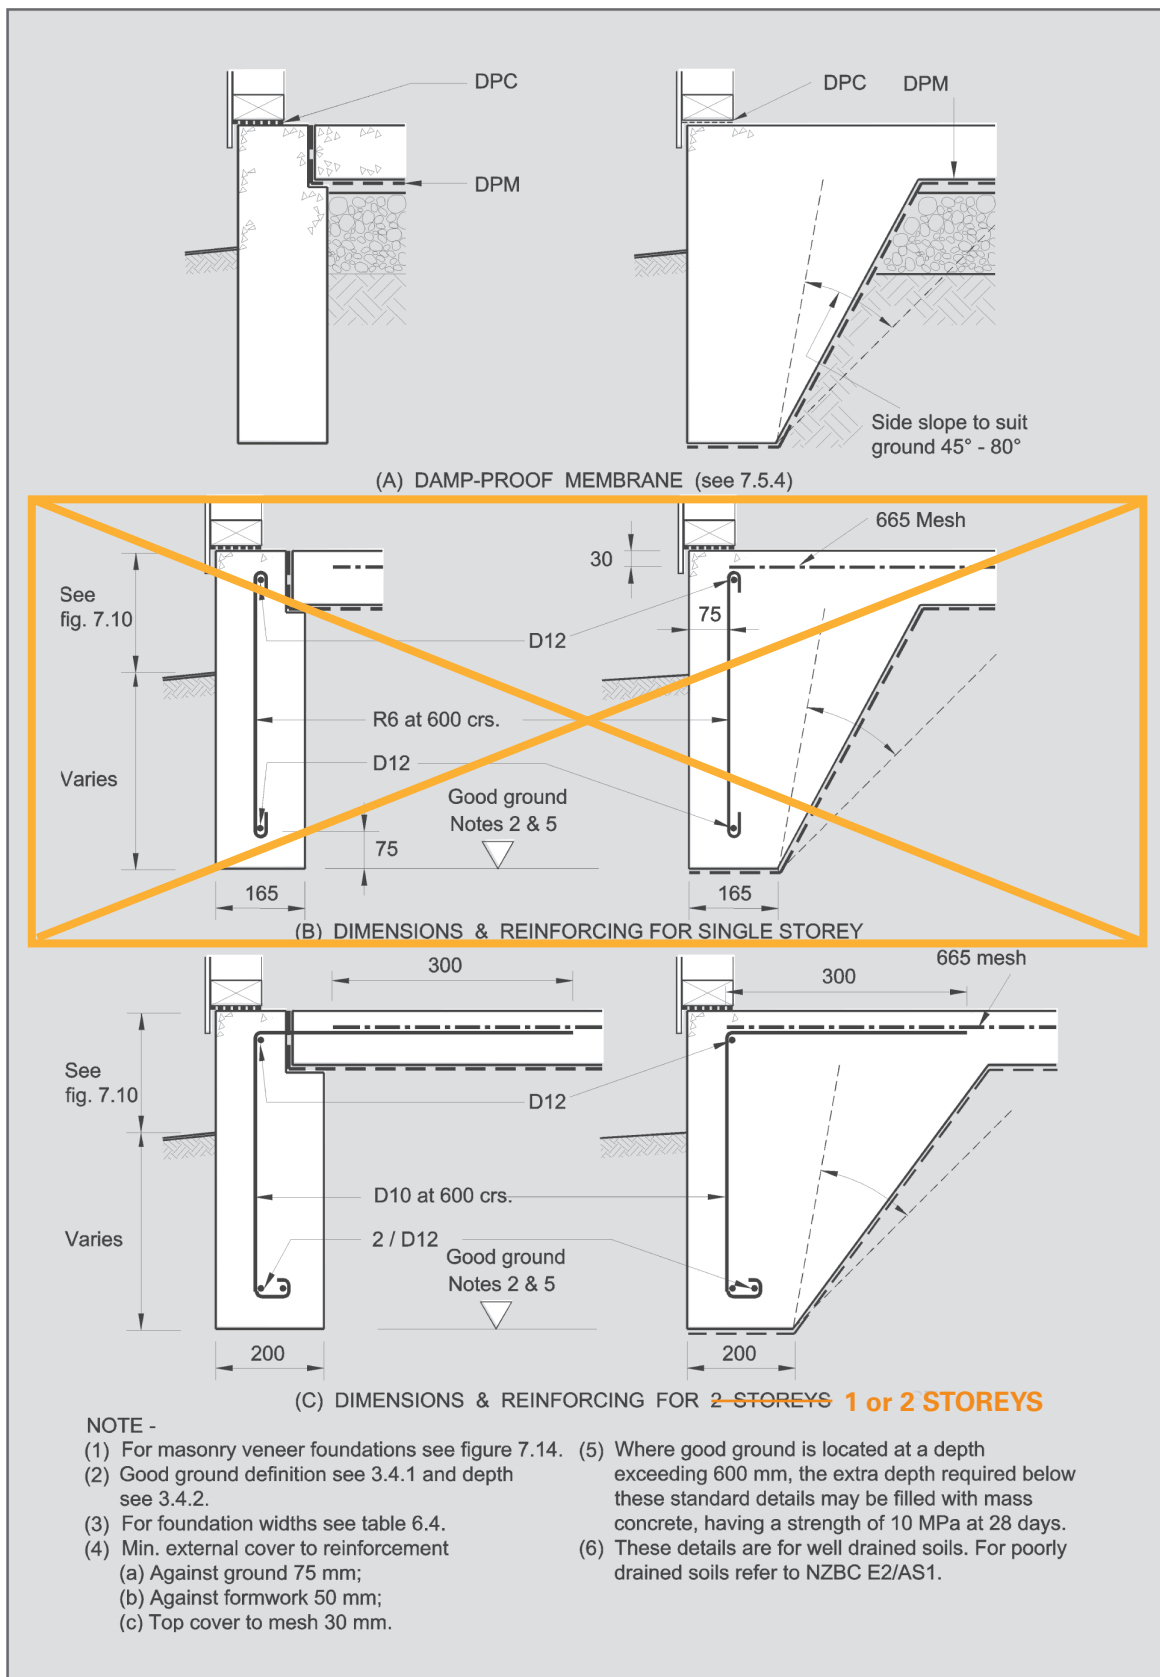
Foundation edge details – *In situ* concrete (see 7.5.2.3)
